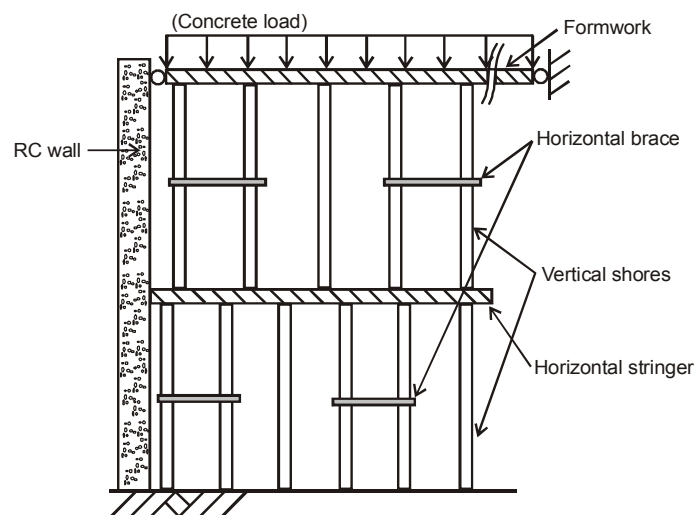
Setup of a Double-layer Shoring System with Horizontal Stringers and Braces
